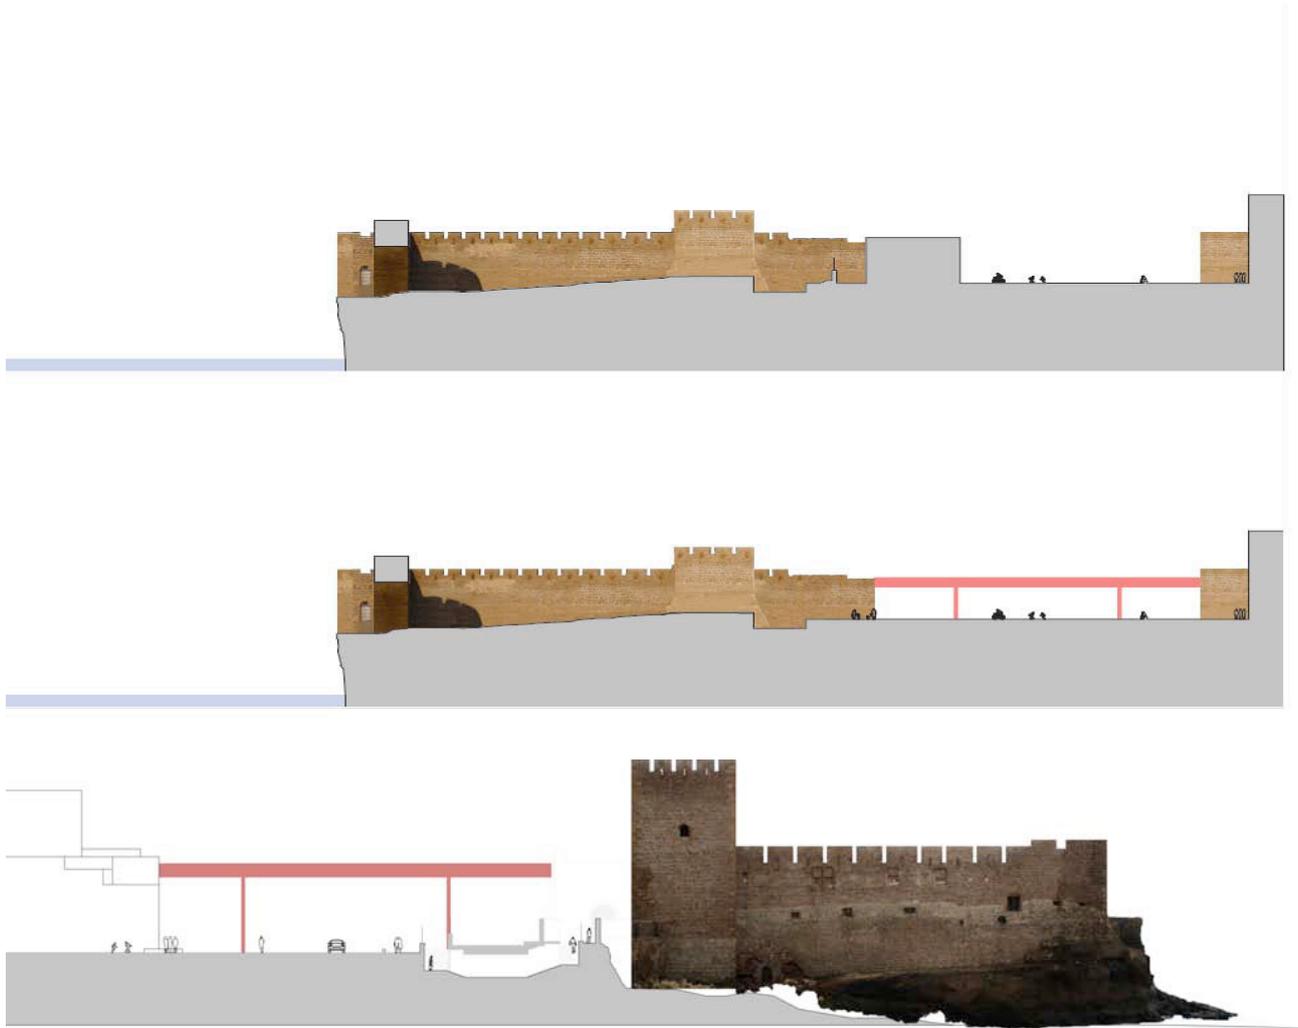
Waterfront renderings for the Sea Castle area with the new wall-sidewalk connection
